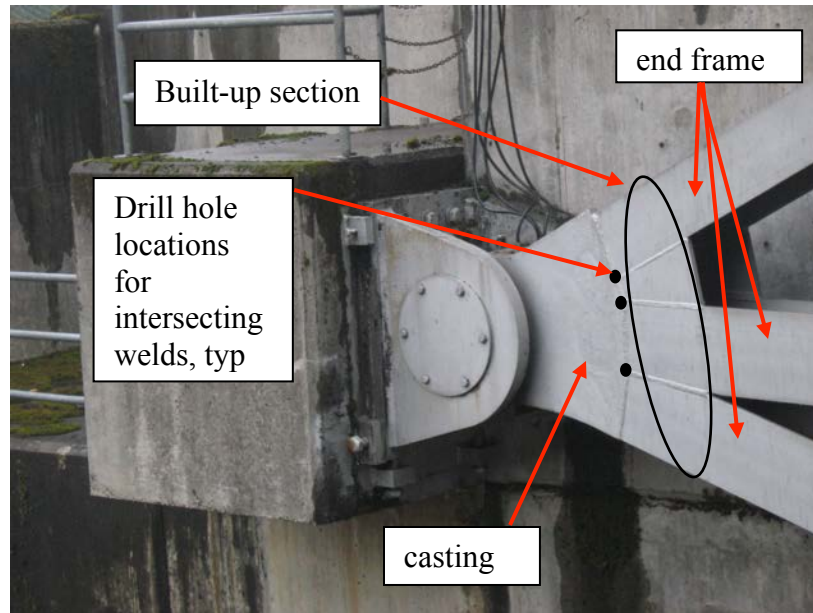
End Frame at Casting Intersecting Welds, Fall Creek Dam, Lowell, Oregon.
